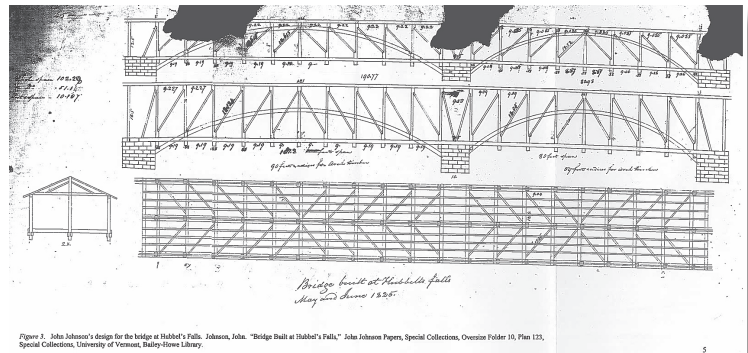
John Johnson's design for the bridge at Hubbell's Falls. Johnson, John. "Bridge built at Hubbell's Falls," John Johnson Papers, Special Collections, Overseas Folder 10, Plan 123, Special Collections, University of Vermont, Bailey-Howe Library.
